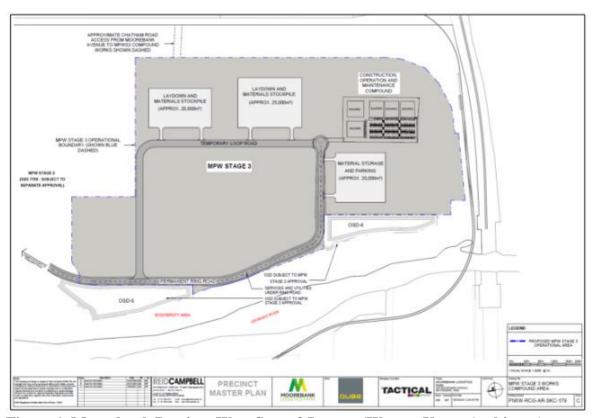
Moorebank Precinct West Stage 3 Layout (Watson YoungArchitects)
